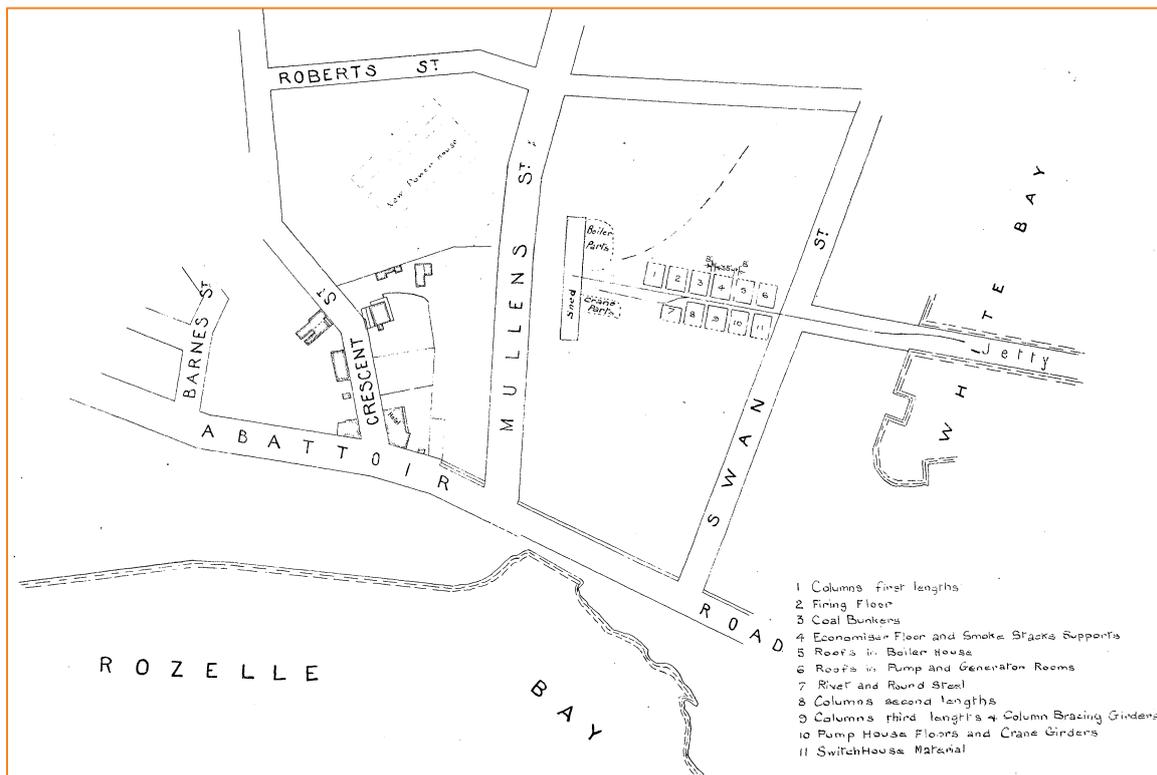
'NSWR Site Plan – White Bay Power House', 21 January 1913. This plan shows temporary sheds in Swan Park for material storage (much of the machinery was imported), and existing buildings in the area of the White Bay Hotel and Padstow House. The outline of the Power House (Stage 1) is also shown dotted. Source: Transport for NSW Plan Room, 0364029
